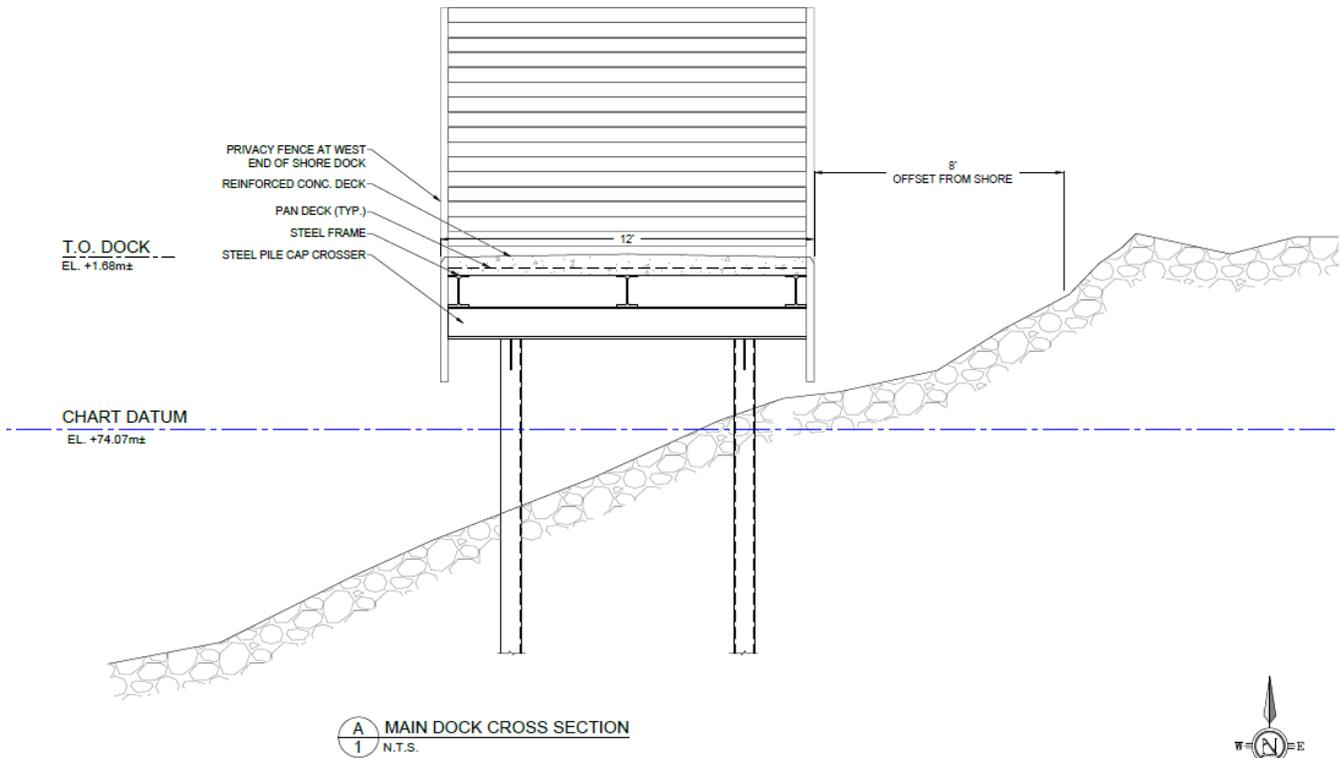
Dock Sectional Elevation (Source: Kehoe Marine Construction Ltd.)
